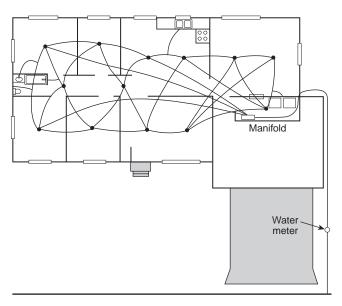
(c) Multipurpose Piping System — Example 3 (Network System).
